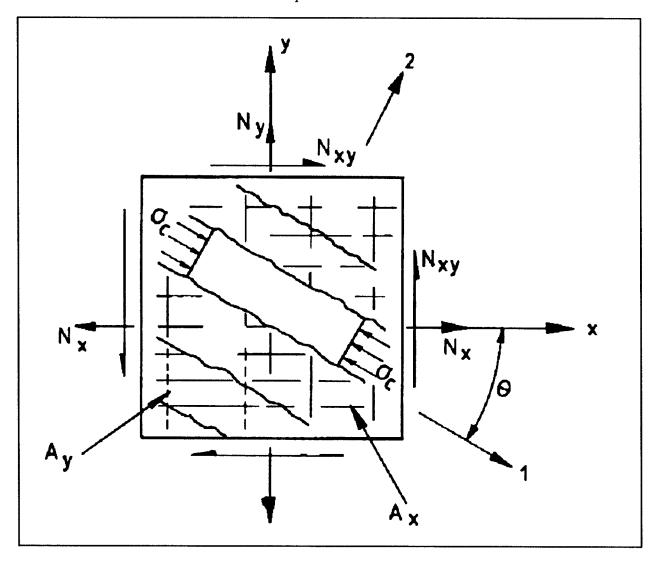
Sectional forces and symbols of a membrane plate/shell element
